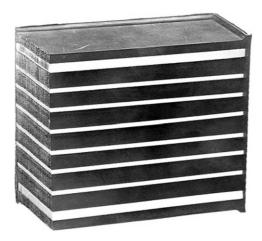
Section from a bridge bearing showing steel plates bonded to rubber
